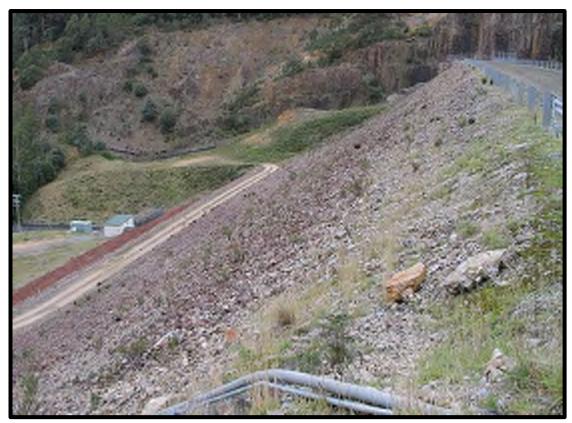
Parangana Dam and Power Station to the north-west of the development site, viewed from Mersey Forest Road.
